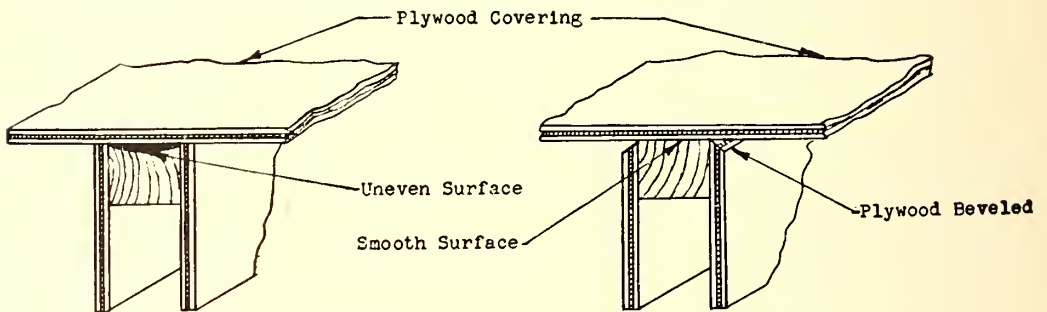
Beveling of Plywood Webs and Gussets.
